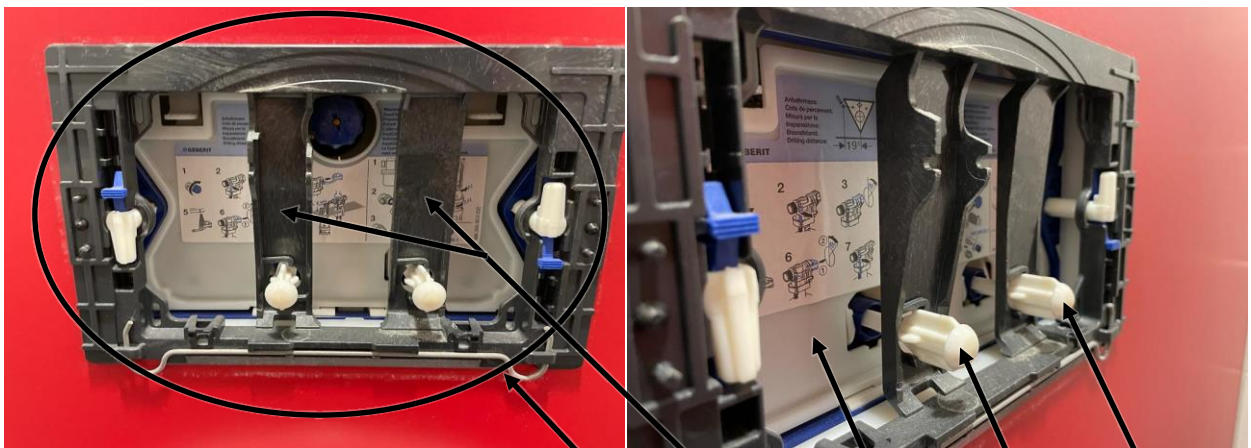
Flushing mechanics when the button panel is removed. Front view (left) and side view (right).
